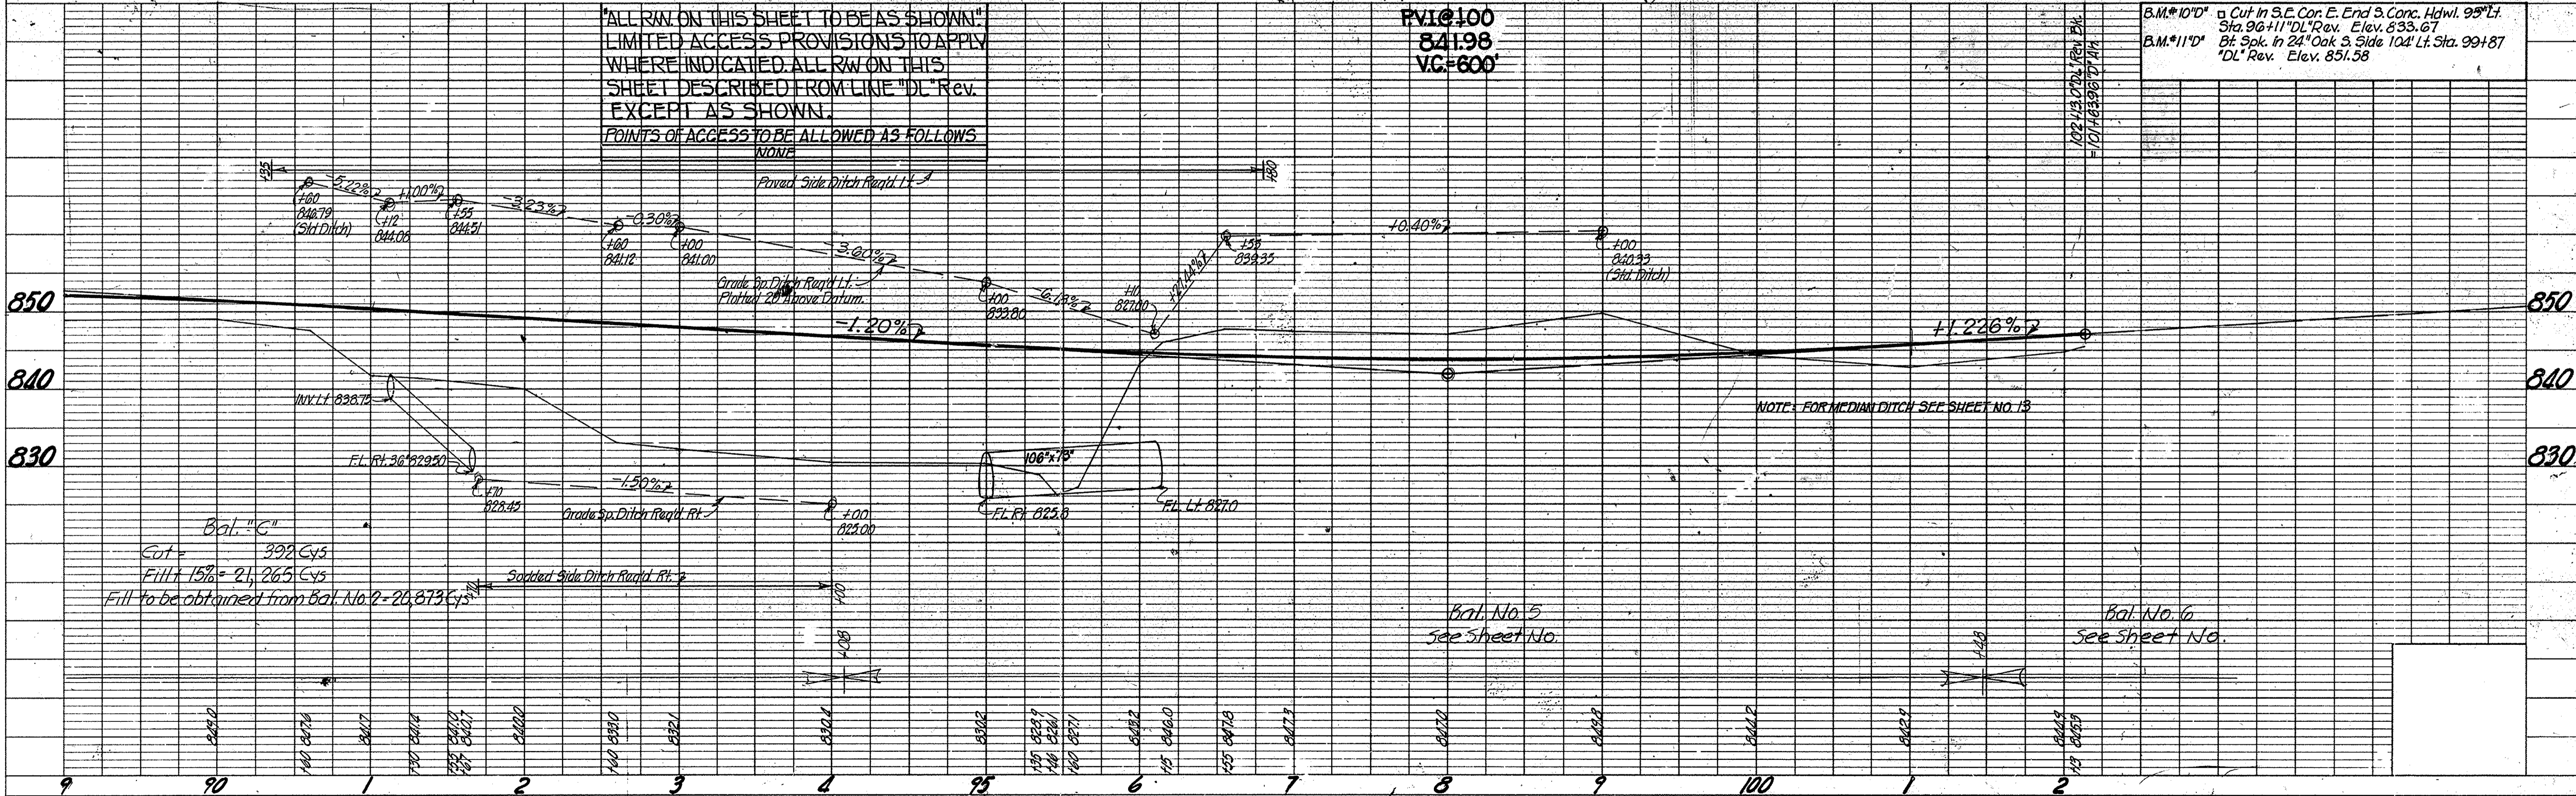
PLAN - PROFILE S. R. R. STANDARD 1975
